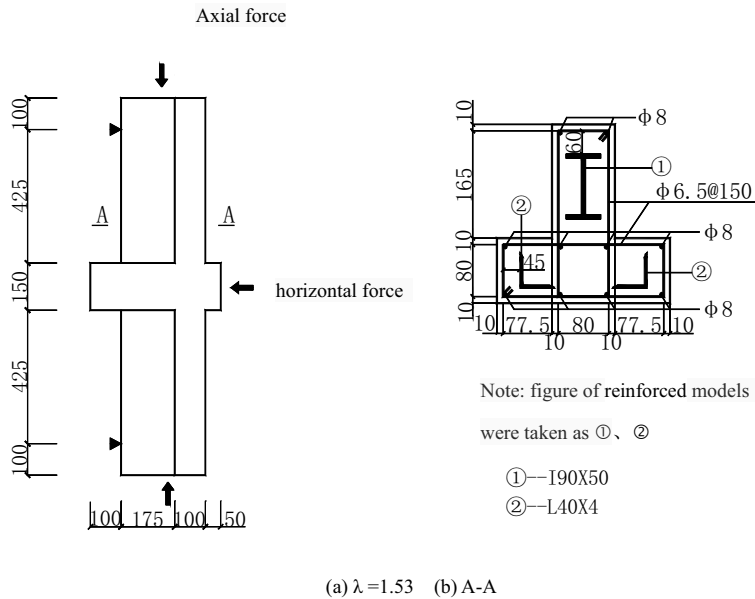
Dimensions and reinforcement details of steel T-shape specimen ($\lambda = 1.53$)
